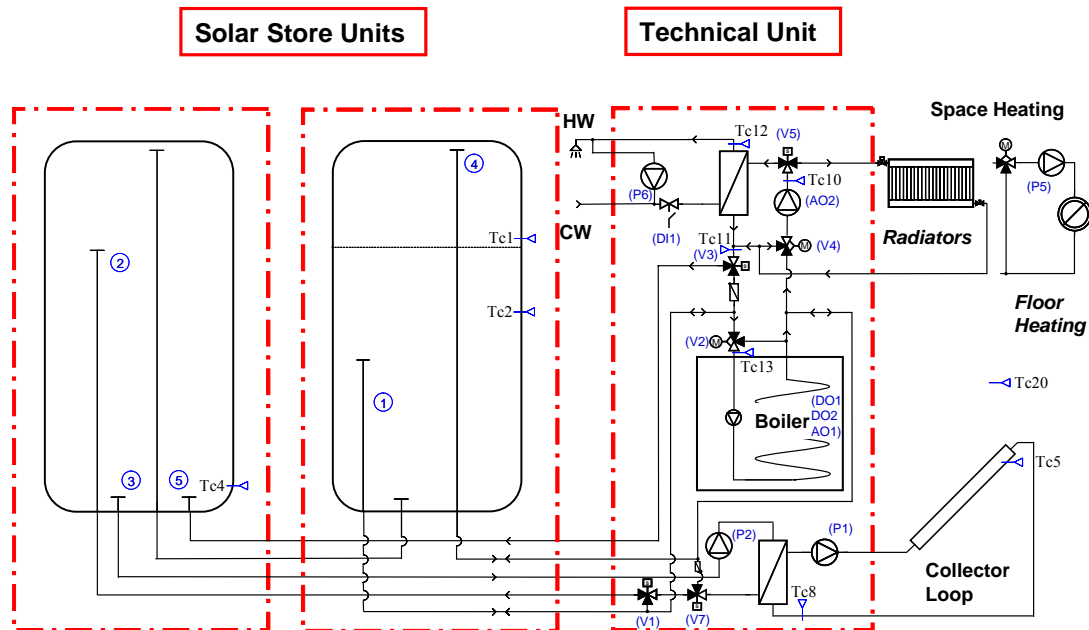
Principle hydraulic scheme of the solar combisystem concept with two tanks to be used with a pellet boiler.
